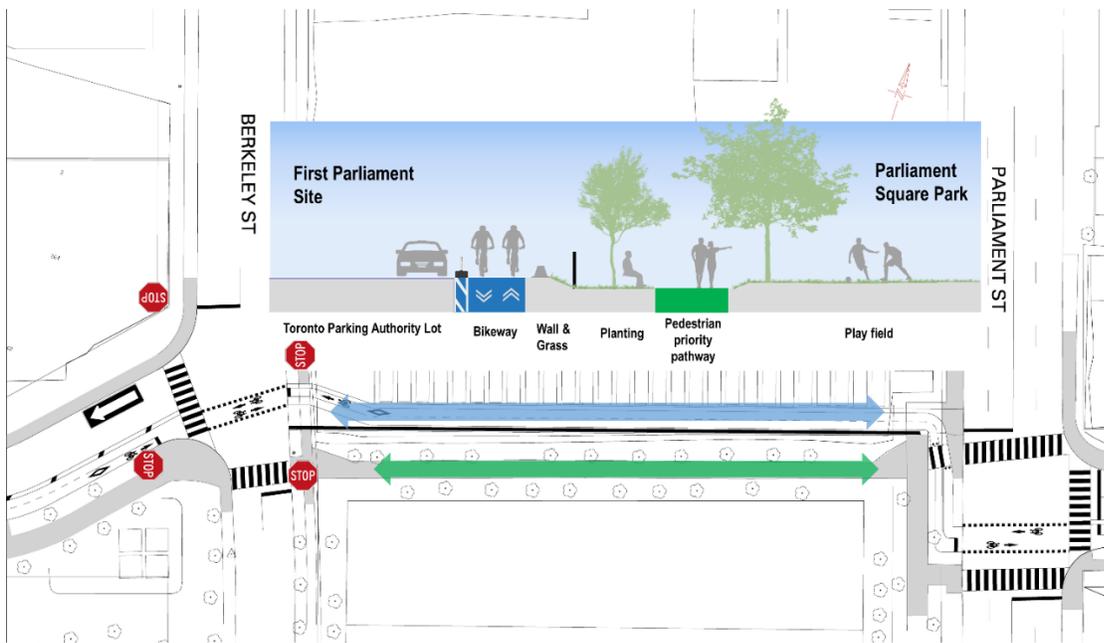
A map and cross-section of the planned reconfiguration of the First Parliament site to include a new bi-directional bikeway separate from the existing narrow path between Berkeley Street and Parliament Street
